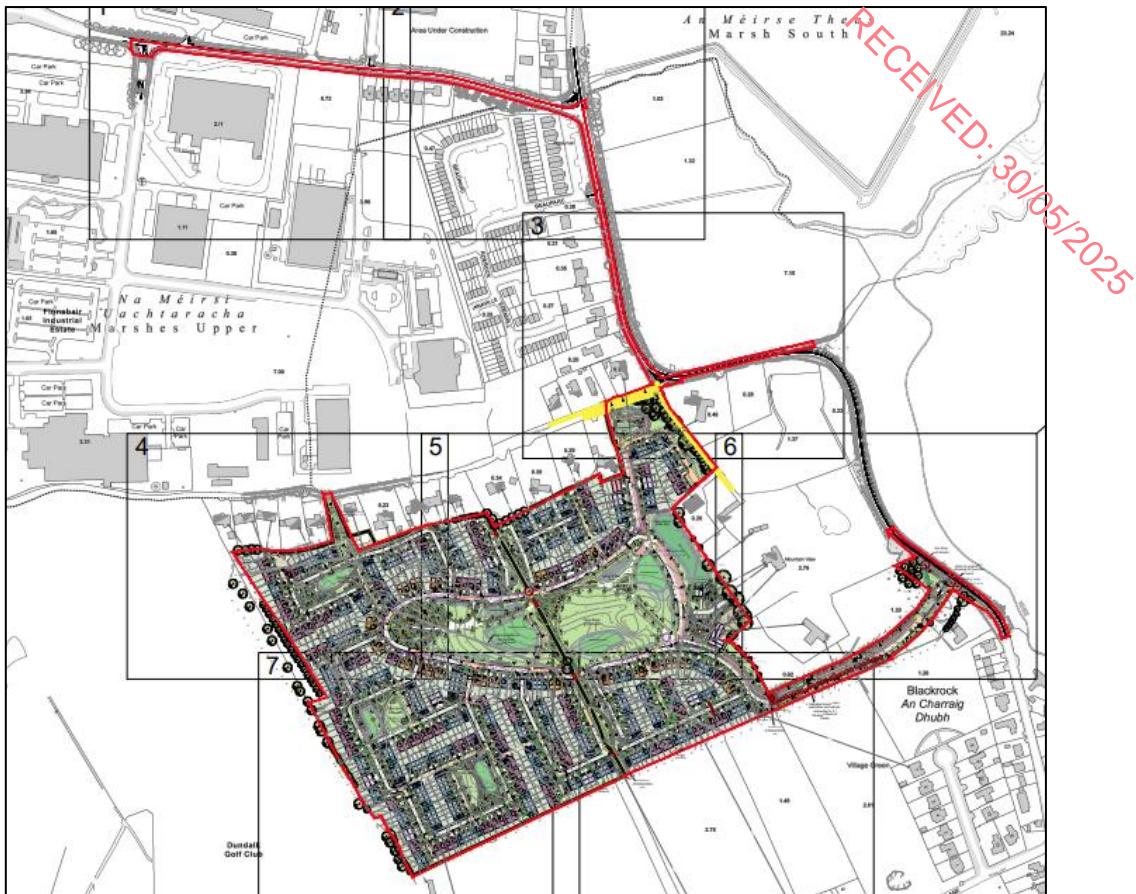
Site Layout – Overall Site Layout (Extract from JFA Drg. No. P1003)
